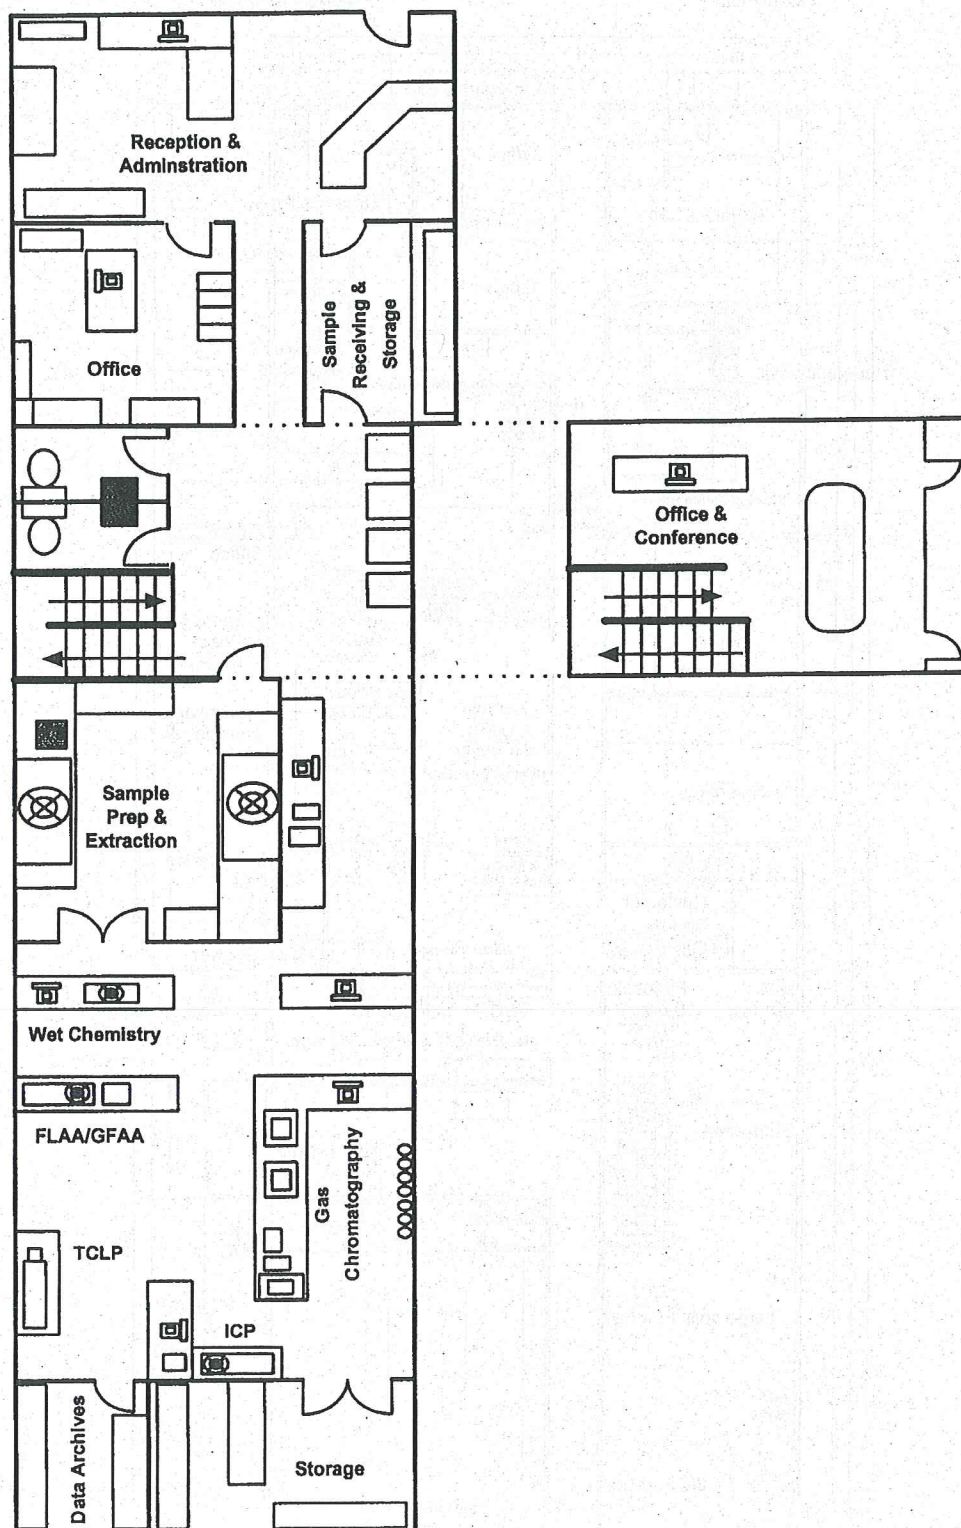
Spokane – First Avenue Facility Floor Plans
